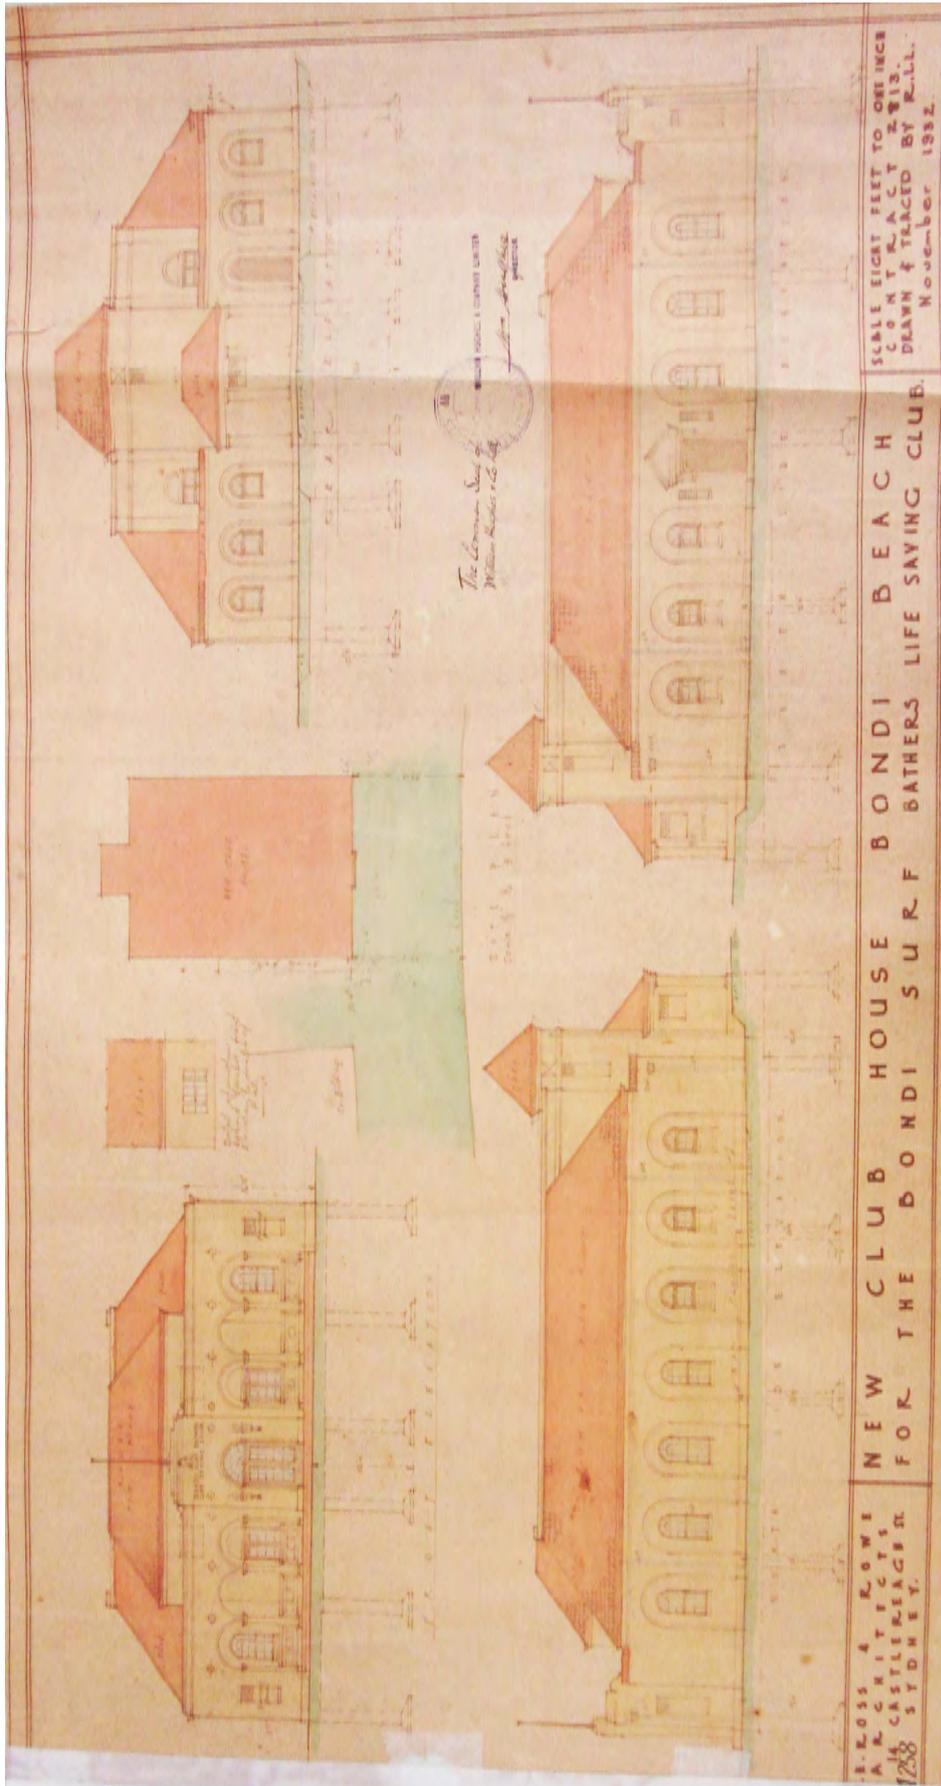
Drawing showing the revised (as built) design of the surf club with the side rooms having pitched roofs The front elevation is similar but the walls of the sunbaking terrace are hidden by the added roofs and semi-circular headed windows and recesses have been added to the side elevations. Source: Jean Rice Architect, photographed at WLS.
